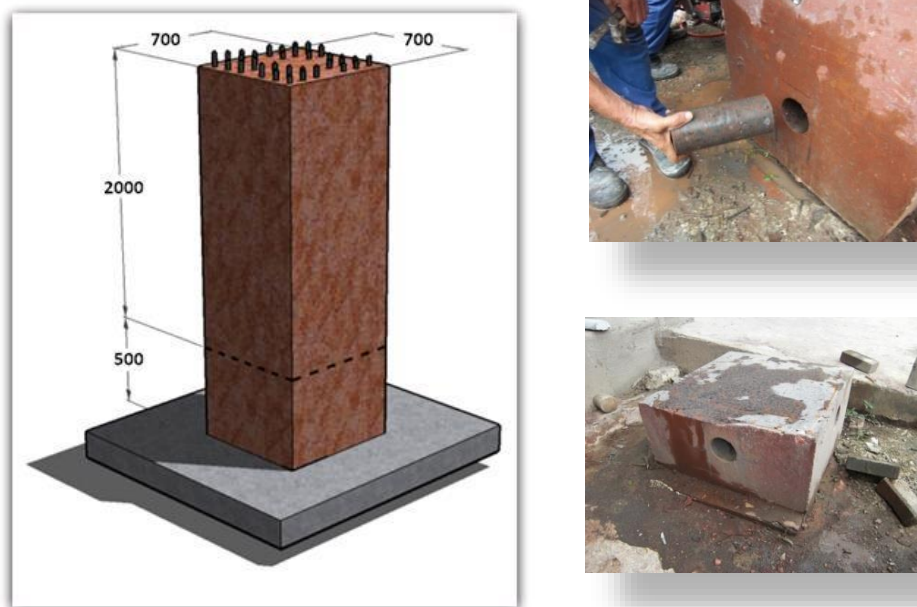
Place at the bottom of the prototype columns where the samples were removed and this lower part of prototype column (remaining), after cutting and extraction. (Note: measures are in mm)
